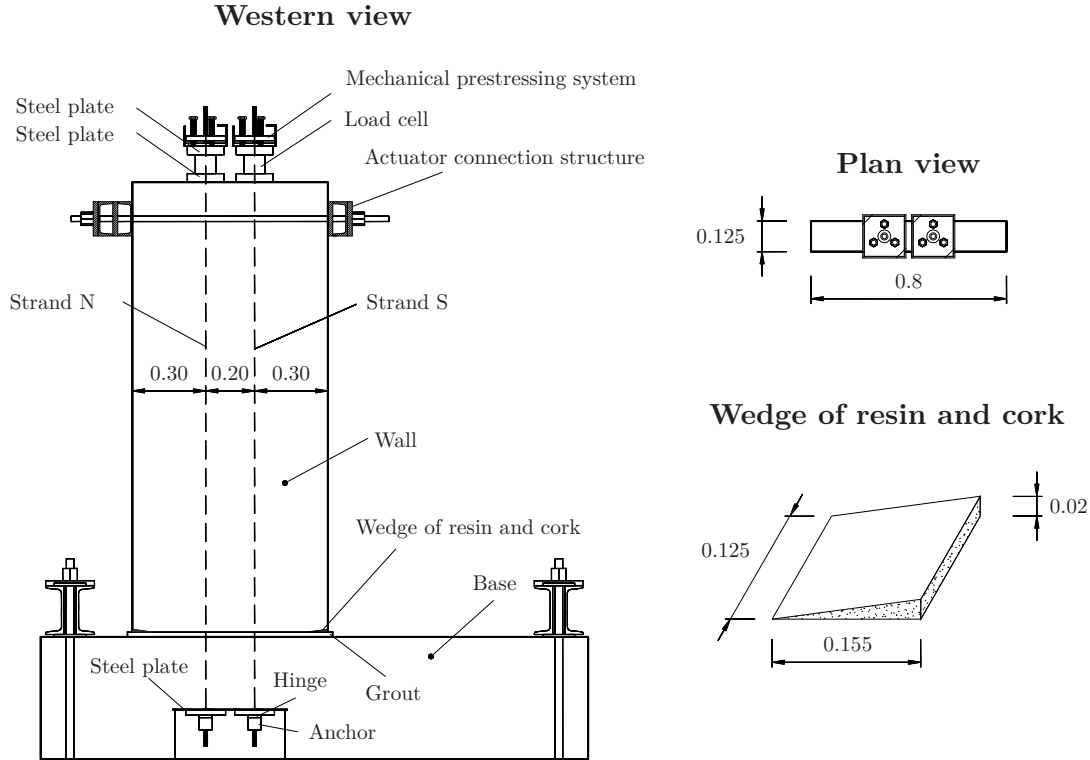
Western and plan views of wall specimen RM3 test setup.
